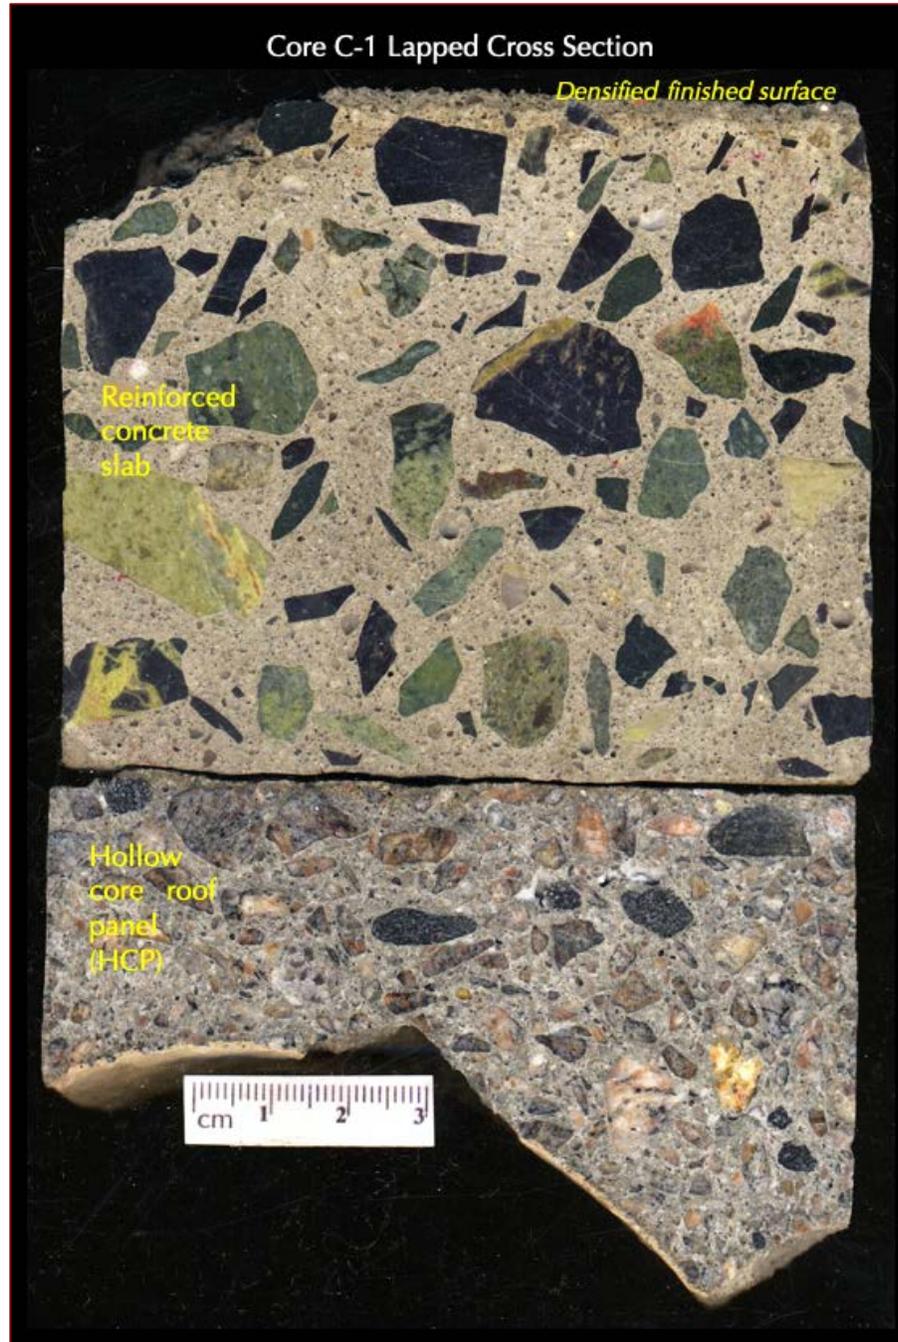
Lapped cross section of Core C-1 showing: (a) the reinforced concrete slab (RCS) at the top, completely de-bonded from the hollow core roof panel (HCP) at the bottom; (b) crushed volcanic stone coarse aggregate of 1 in. (25 mm) nominal size in RCS as opposed to crushed granite coarse aggregate of 1/2 in. (12.5 mm) nominal size in HCP; (c) medium beige color tone of paste in RCS as opposed to darker gray paste in HCP; (d) densified finished surface of RCS at the top 1/8 in.; (e) relatively better grading of crushed granite coarse aggregate in HCP as opposed to crushed volcanic rock coarse aggregate in RCS; (f) overall dense and well-consolidated natures of RCS and HCP concretes; and (g) relatively clear separation of RCS from HCP with no trace of one adhered to the other.
